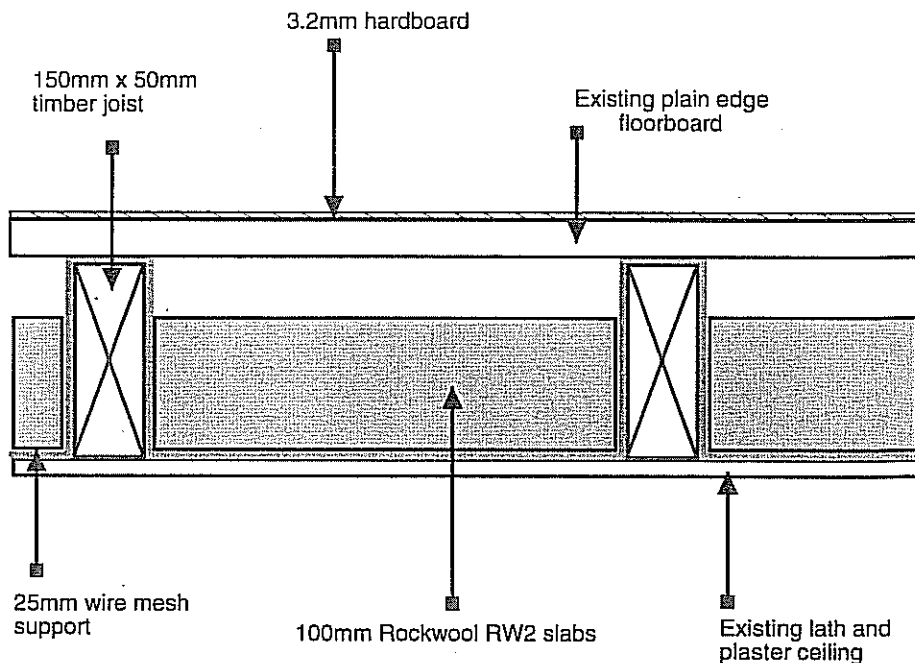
Use of Rockwool Slabs above an existing ceiling to provide 30 minutes fire resistance
